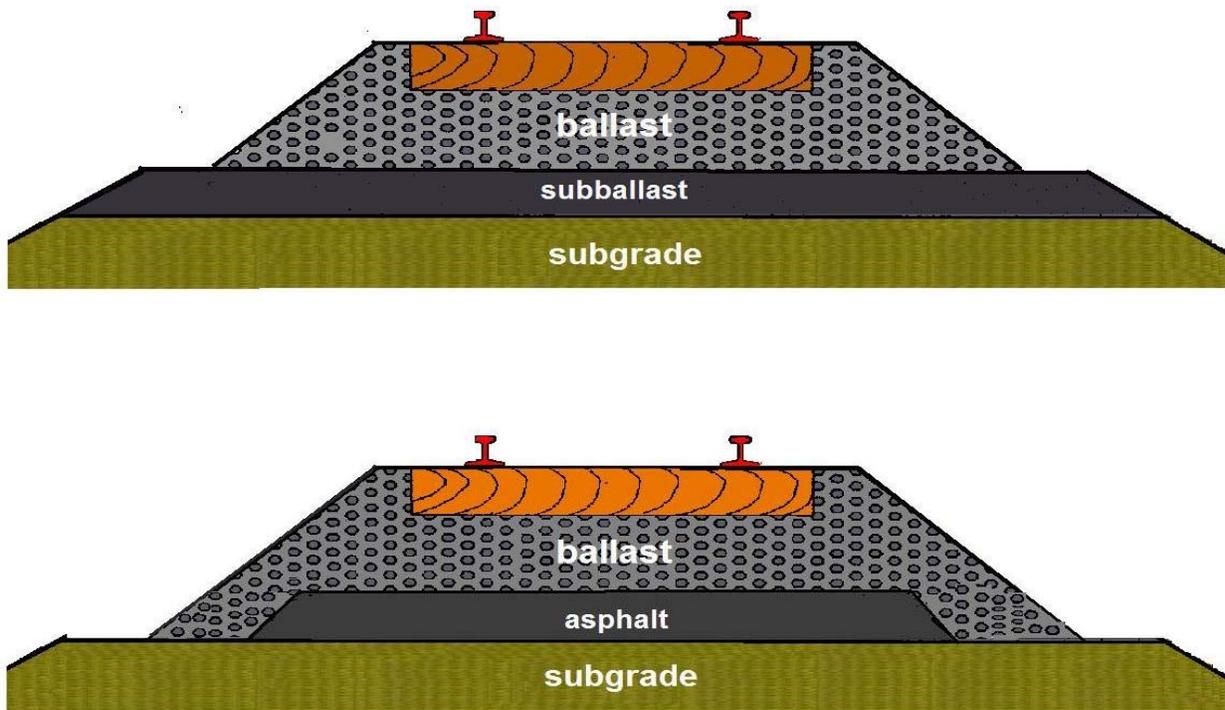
Cross-sectional views of all-granular and asphalt underlayment crossings.
